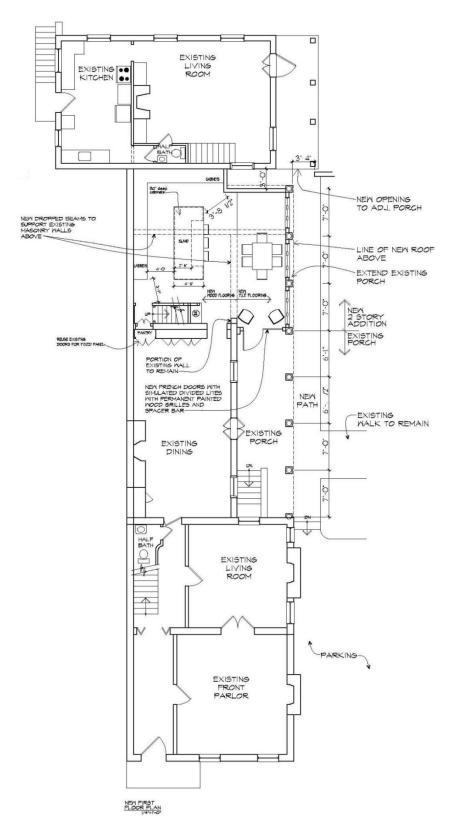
Initial proposal showing first floor plan, as submitted by applicant. Both the north and east masonry walls of the existing kitchen are removed entirely at the first floor.
